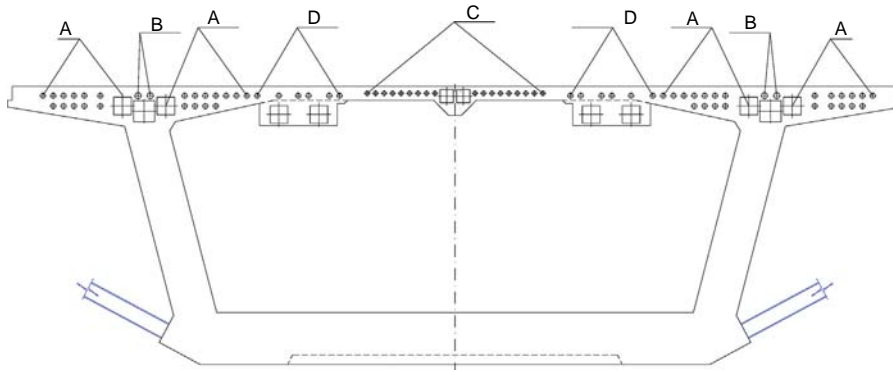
Prestressing in the main viaduct. Cross section in front of Segment Zero.
